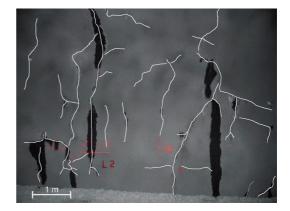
Surface observations of cracks in sprayed concrete
